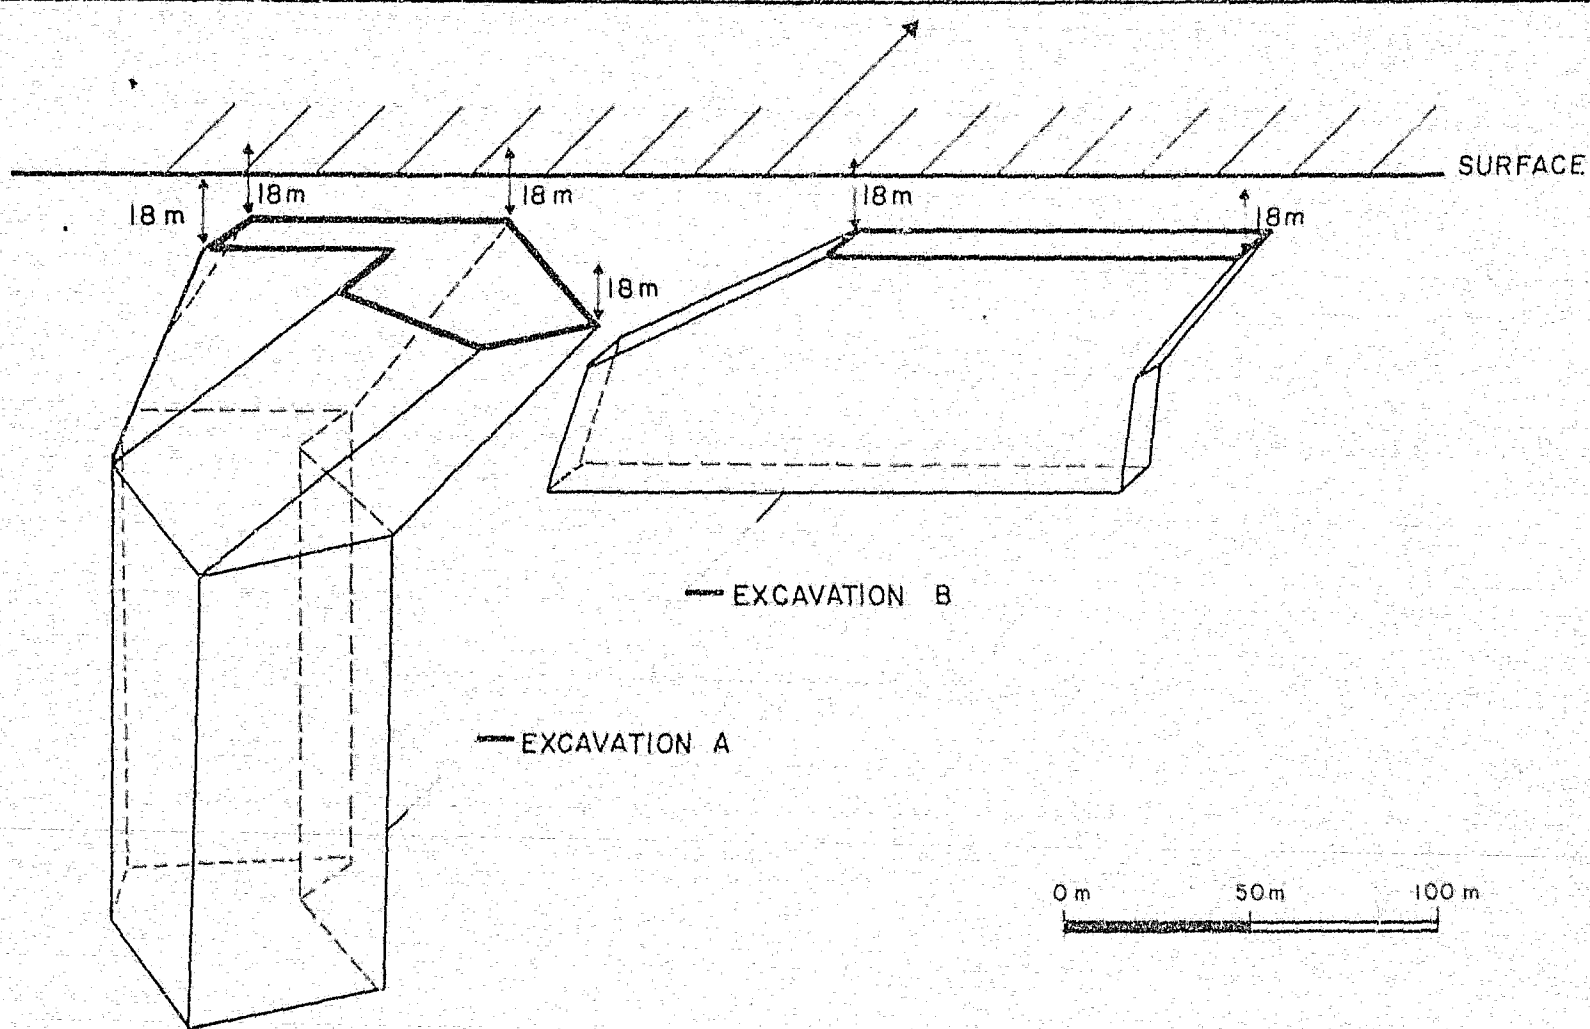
GEOMETRY USED TO MODEL FAILURE OF CROWN PILLAR ABOVE EXCAVATION A
